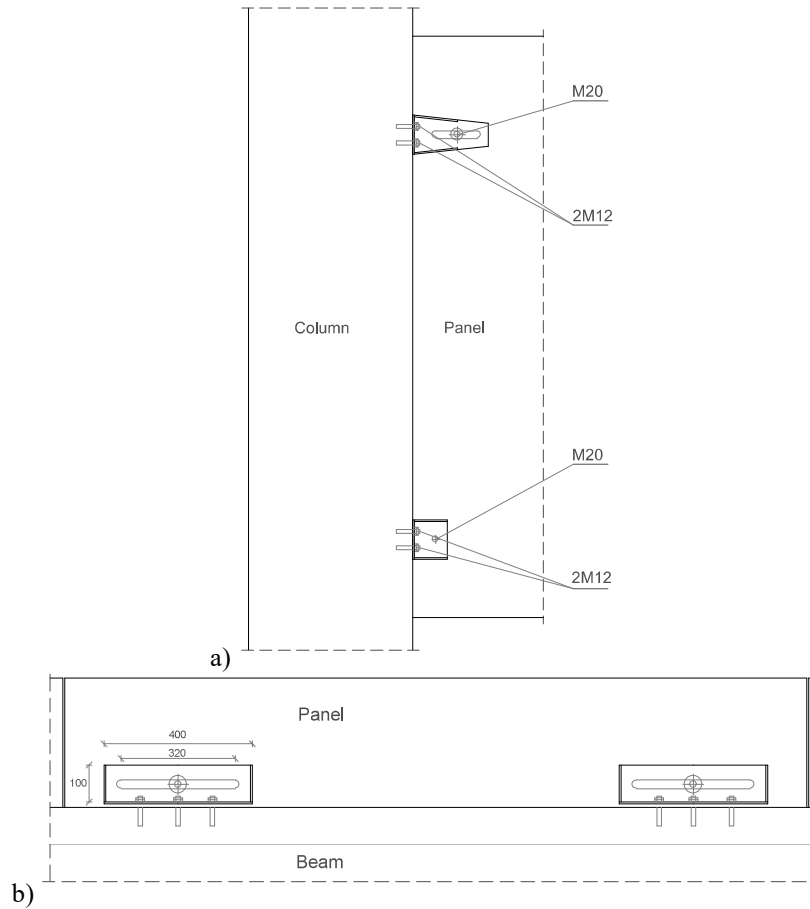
Details of the new connections for the (a) horizontal and (b) vertical panels.
